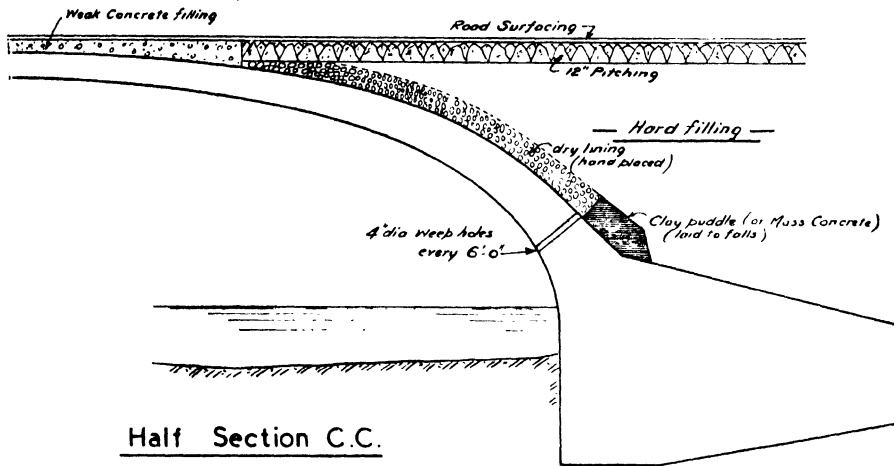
WIDENING OF WOOLLEY BRIDGE: PART TRANSVERSE SECTION (see facing page.)
